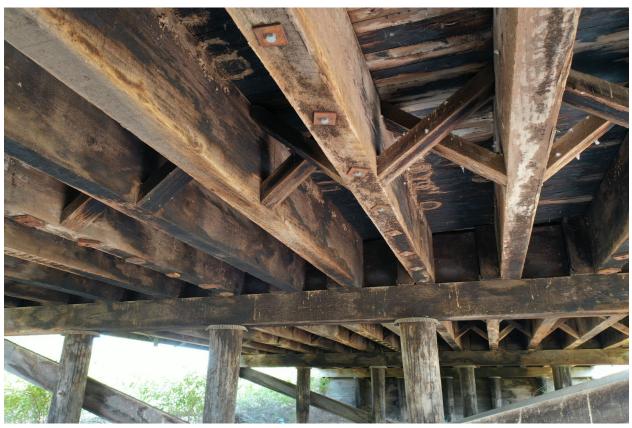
Bridge O-19-D showing proximity to the railroad bridge upstream
